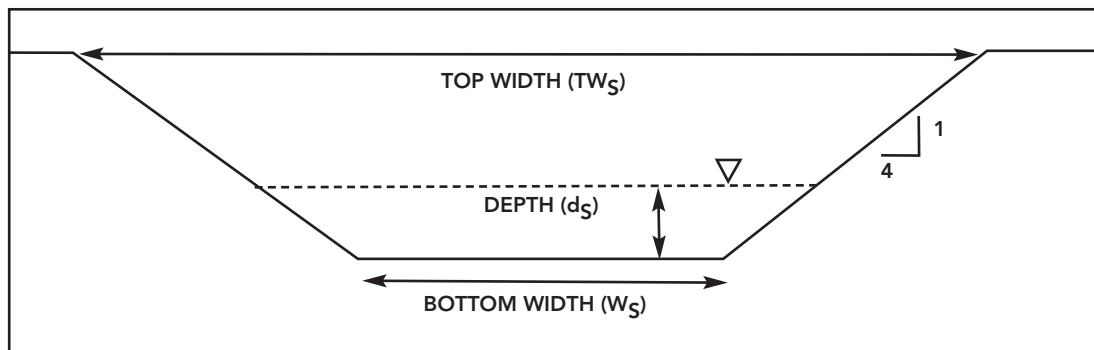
Trapezoidal Cross Section with 4:1 Side Slopes
